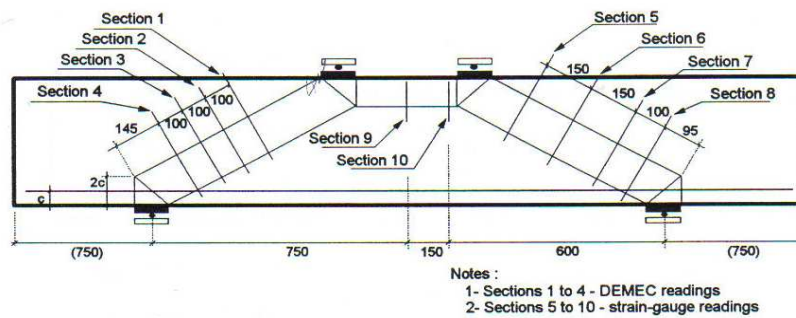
Ortiz Beam 2- Considered Struts and Instrumented Section
